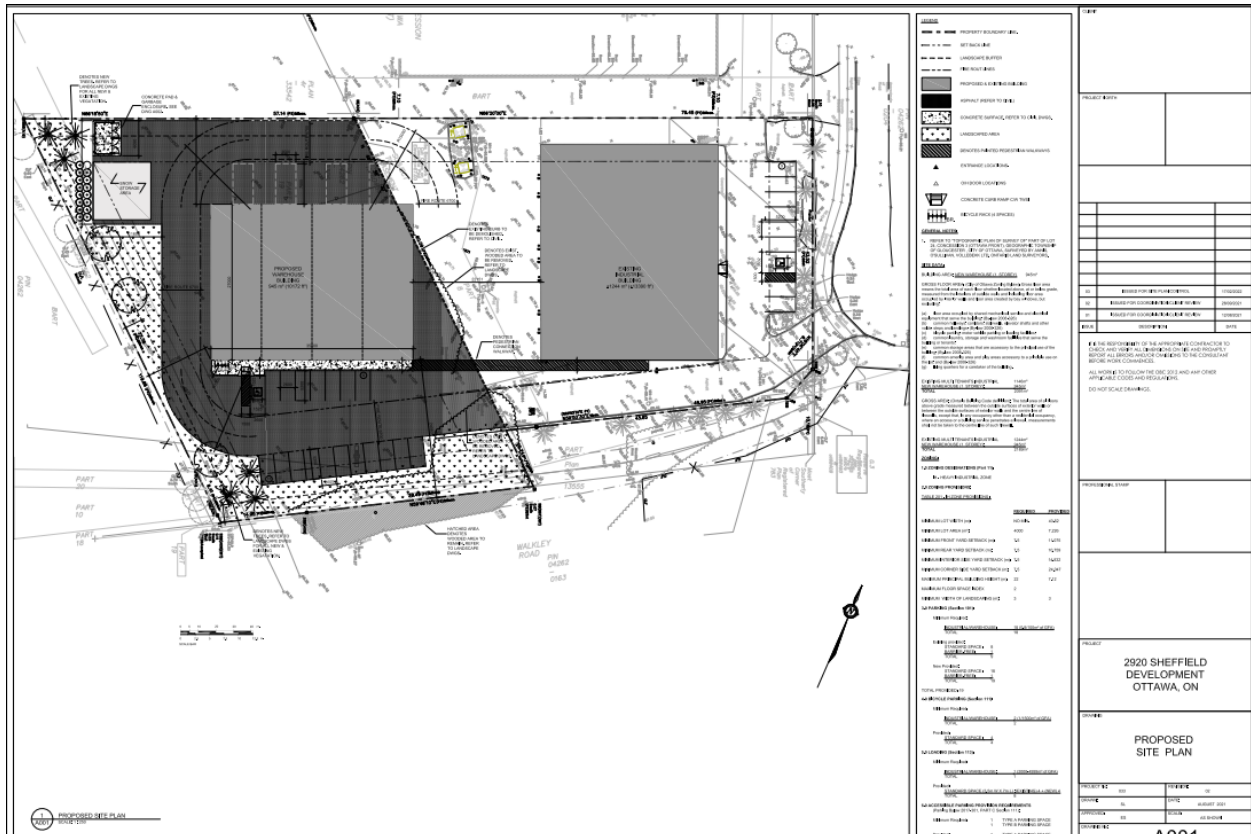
below represents the site development concept plan prepared by Eric Schlange, Architect, for the proposed warehouse building, including associated works to be carried out to integrate the new structure and site functions with existing development.
